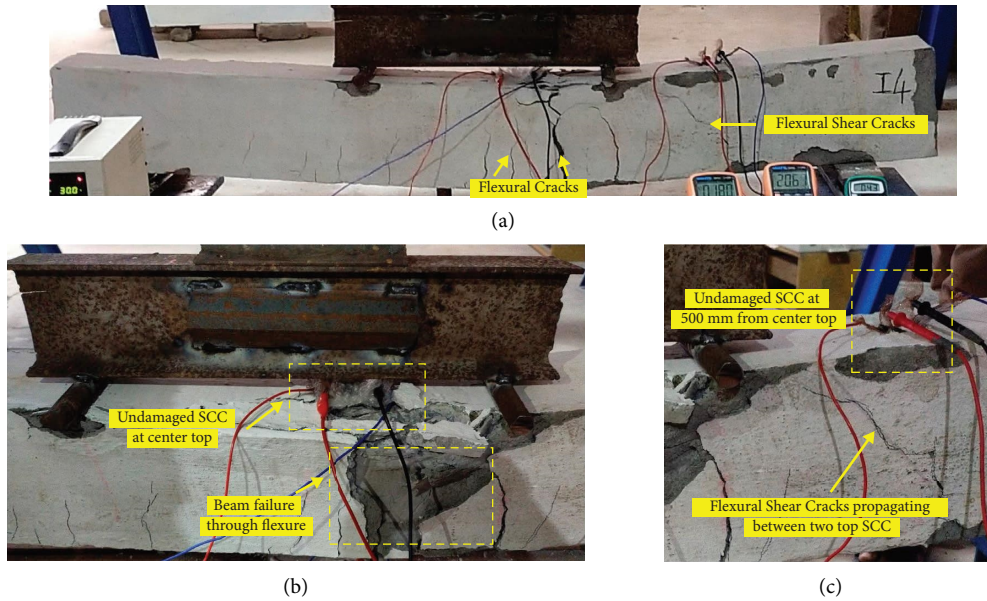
Real-time image of a damaged flexural beam with embedded SCC incorporating AC, demonstrating (a) the formation of flexural cracks and flexural shear cracks in the beams, (b) unbroken SCC at the bottom of the beam with beam failure due to flexure, and (c) intact SCC at 500 mm from the center top of the beam with flexural cracks propagating between two SCC embedded at beam top.
